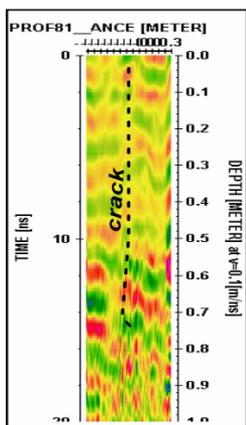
Interpreted GPR profile No.81 of the outside wall near elevator door.
